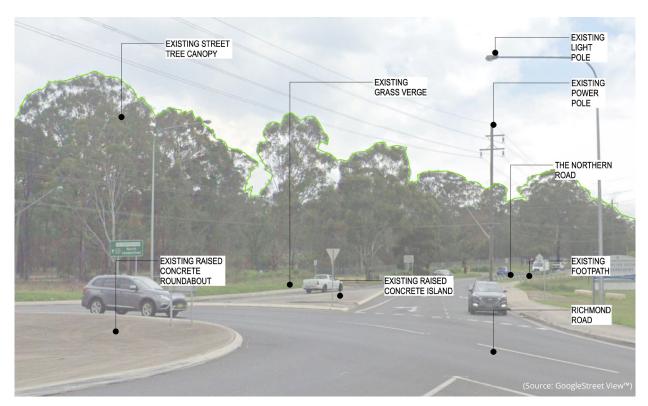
Viewpoint 6 - Intersection of Richmond Road with The Northern Road (facing south) - Existing view
